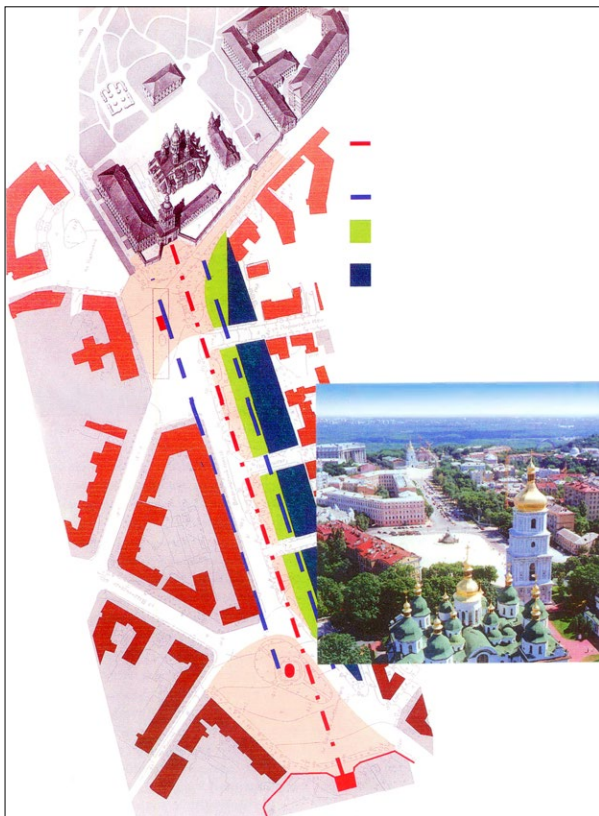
Site layout plan M 1: 2000. An axis between the Sofia and Mykhailovska bell towers.
